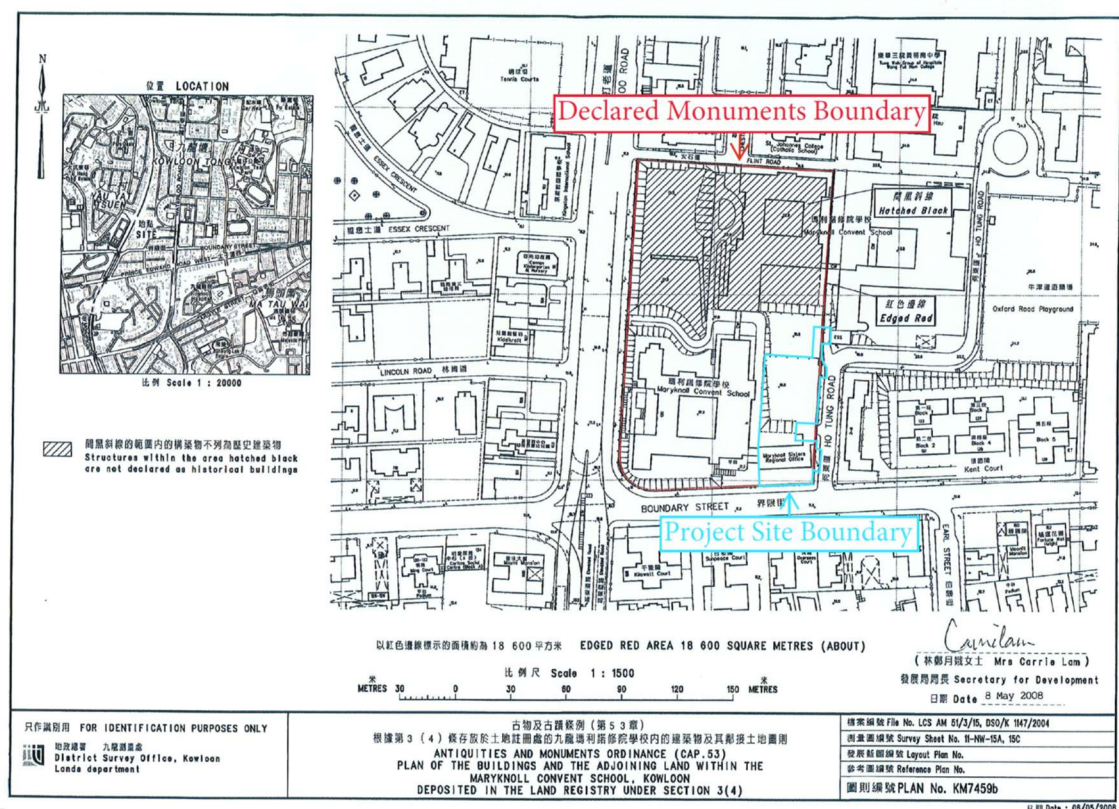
The location of Convent Building Project Site boundary and Declared Monuments boundary
